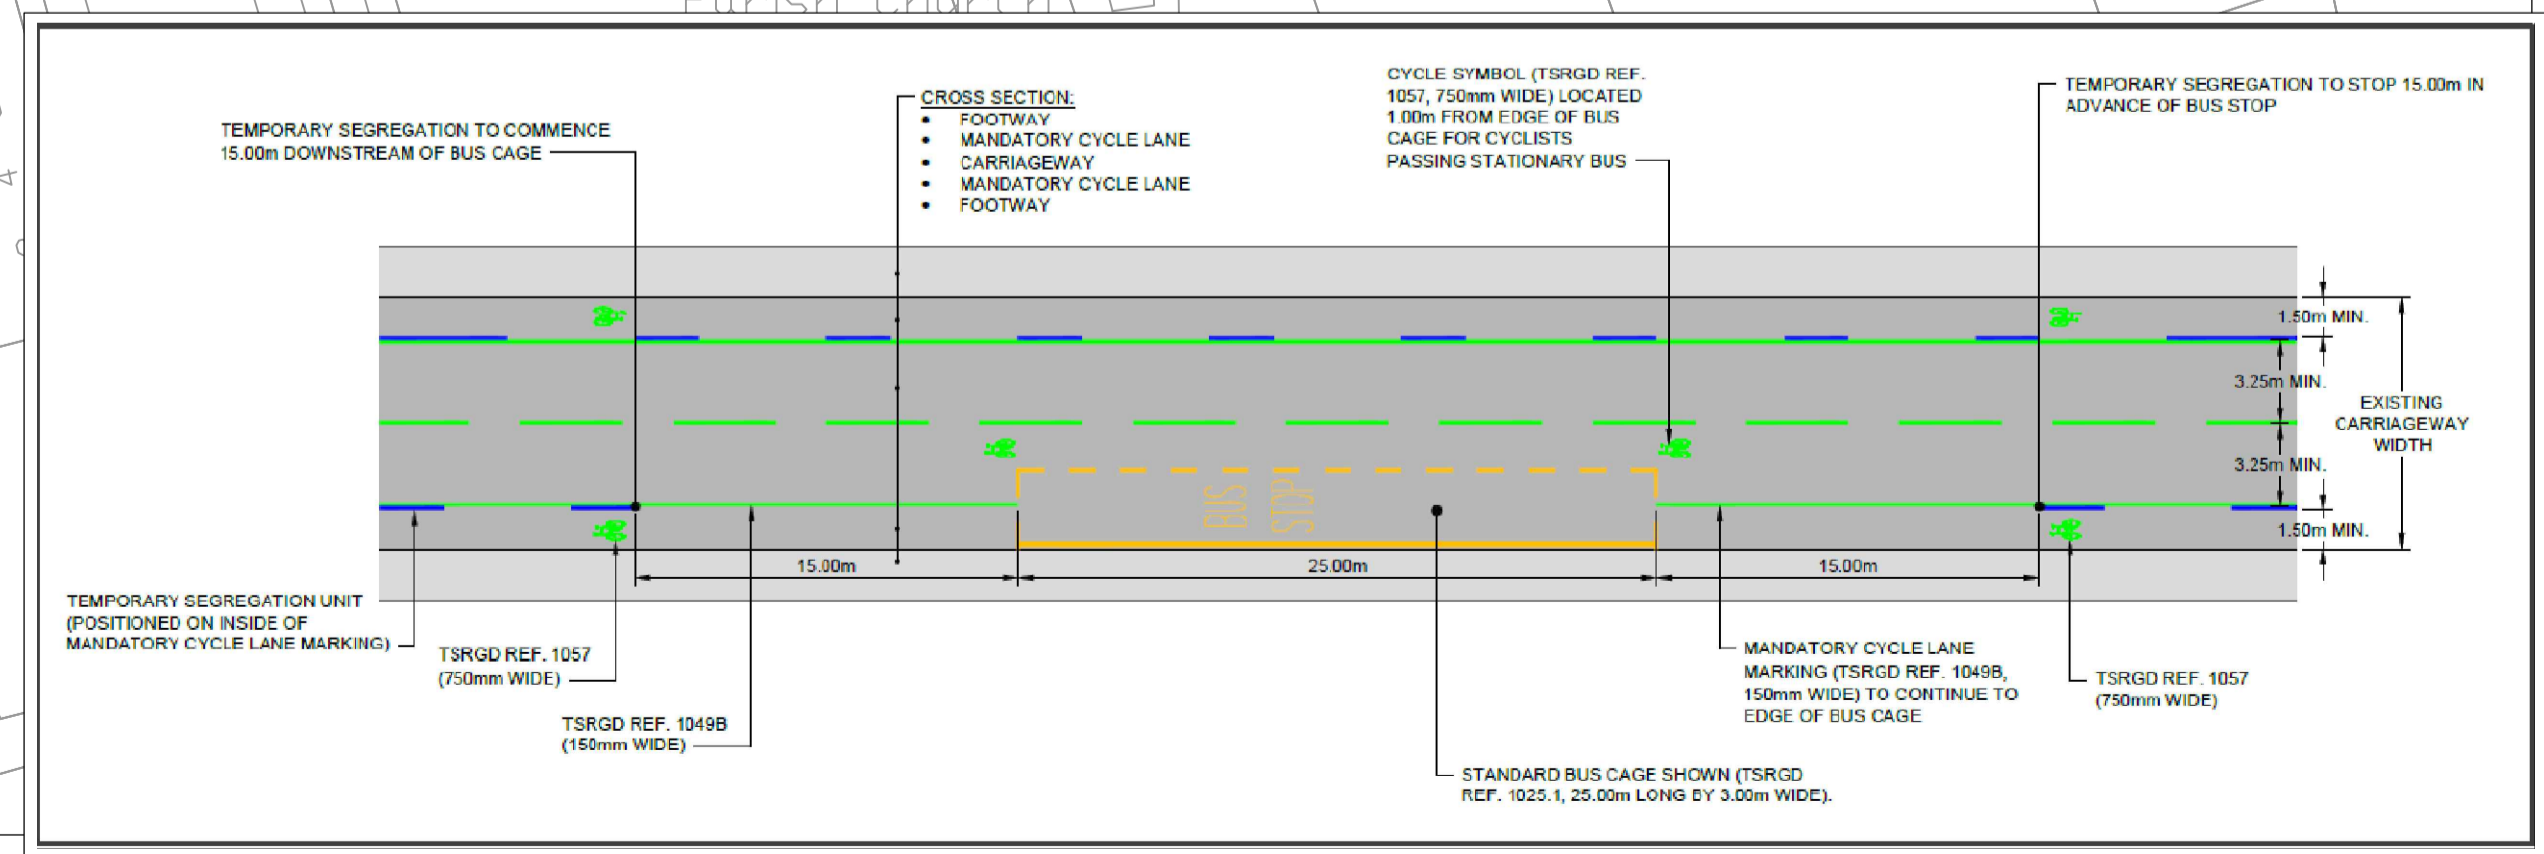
LINE TYPE / CYCLE LANE DEFENDER ARRANGEMENT DETAILS AT BUS STOPS
